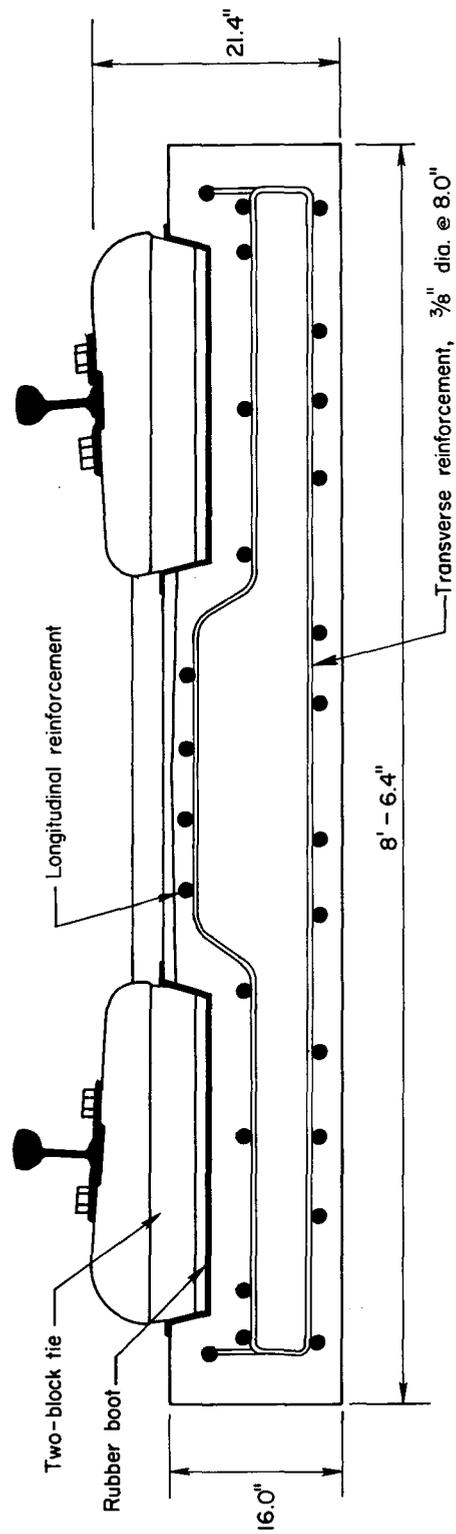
SLAB CROSS SECTION OF SWISS RAILWAYS TRACK
